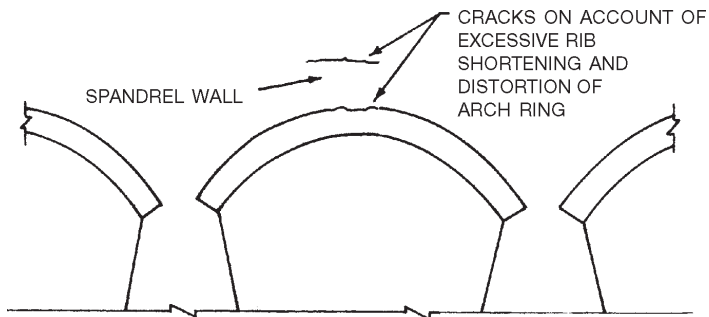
(a) Cracks in spandrel wall due to weakness in arch ring
